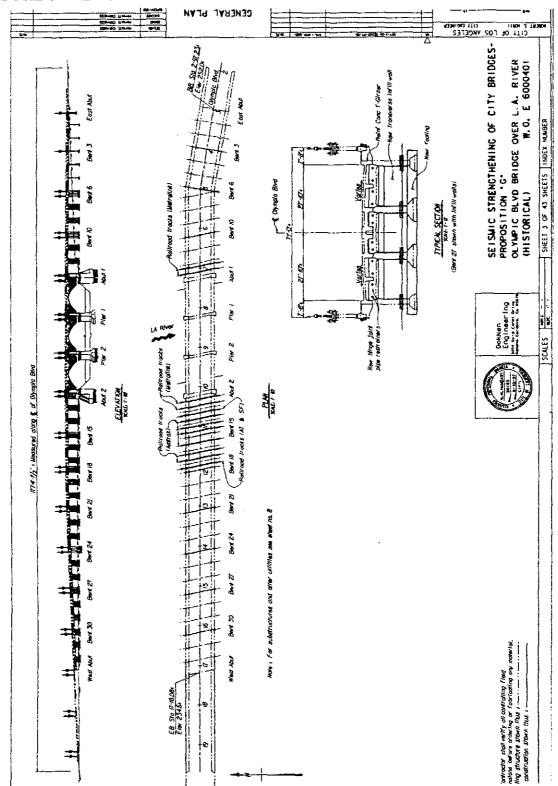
INFILL SHEAR WALL/LONGITUDINAL FRAME PLAN SHEET
